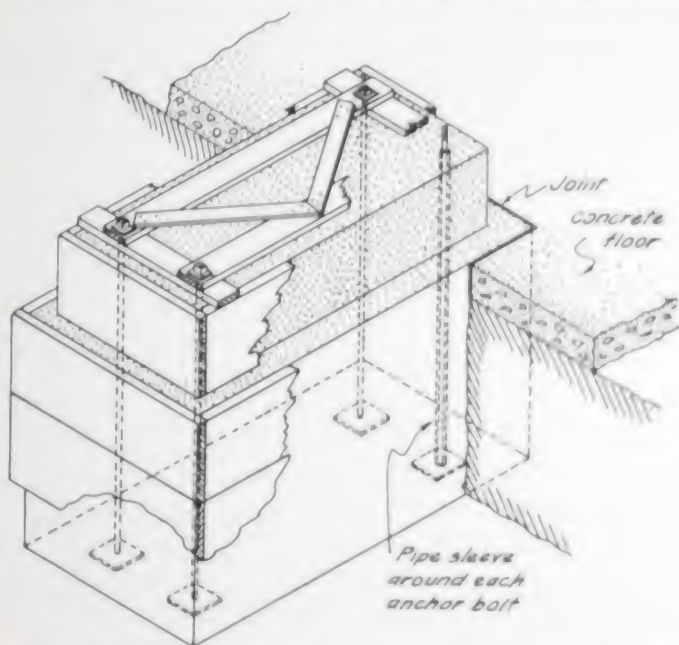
Method of building forms for a foundation such as would be used for a small gasoline engine or cream separator. Notice that the foundation is constructed independently of the concrete floor when such is used.
